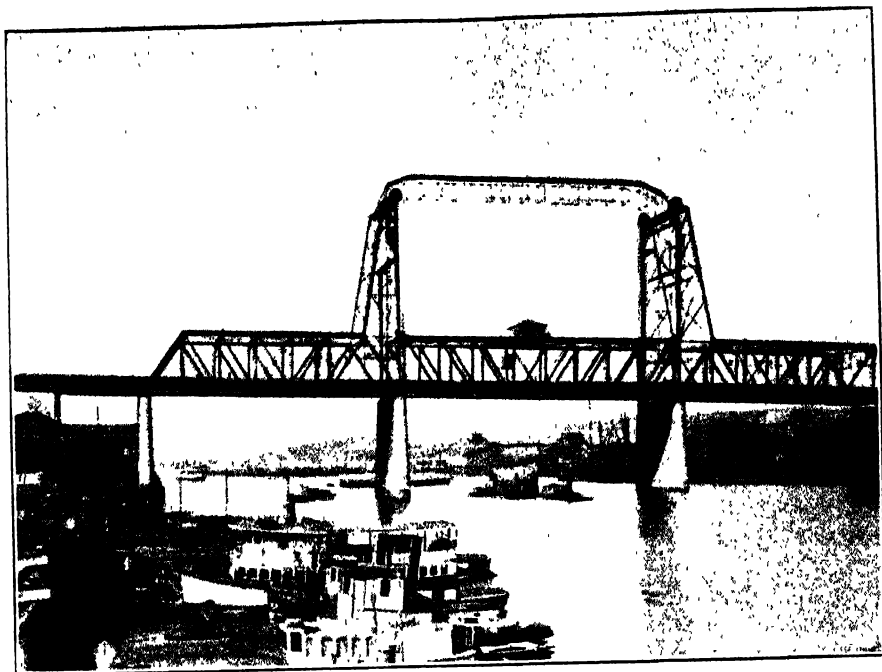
Bridge over the City Waterway at Tacoma, Wash.—Lifting Span Down.
